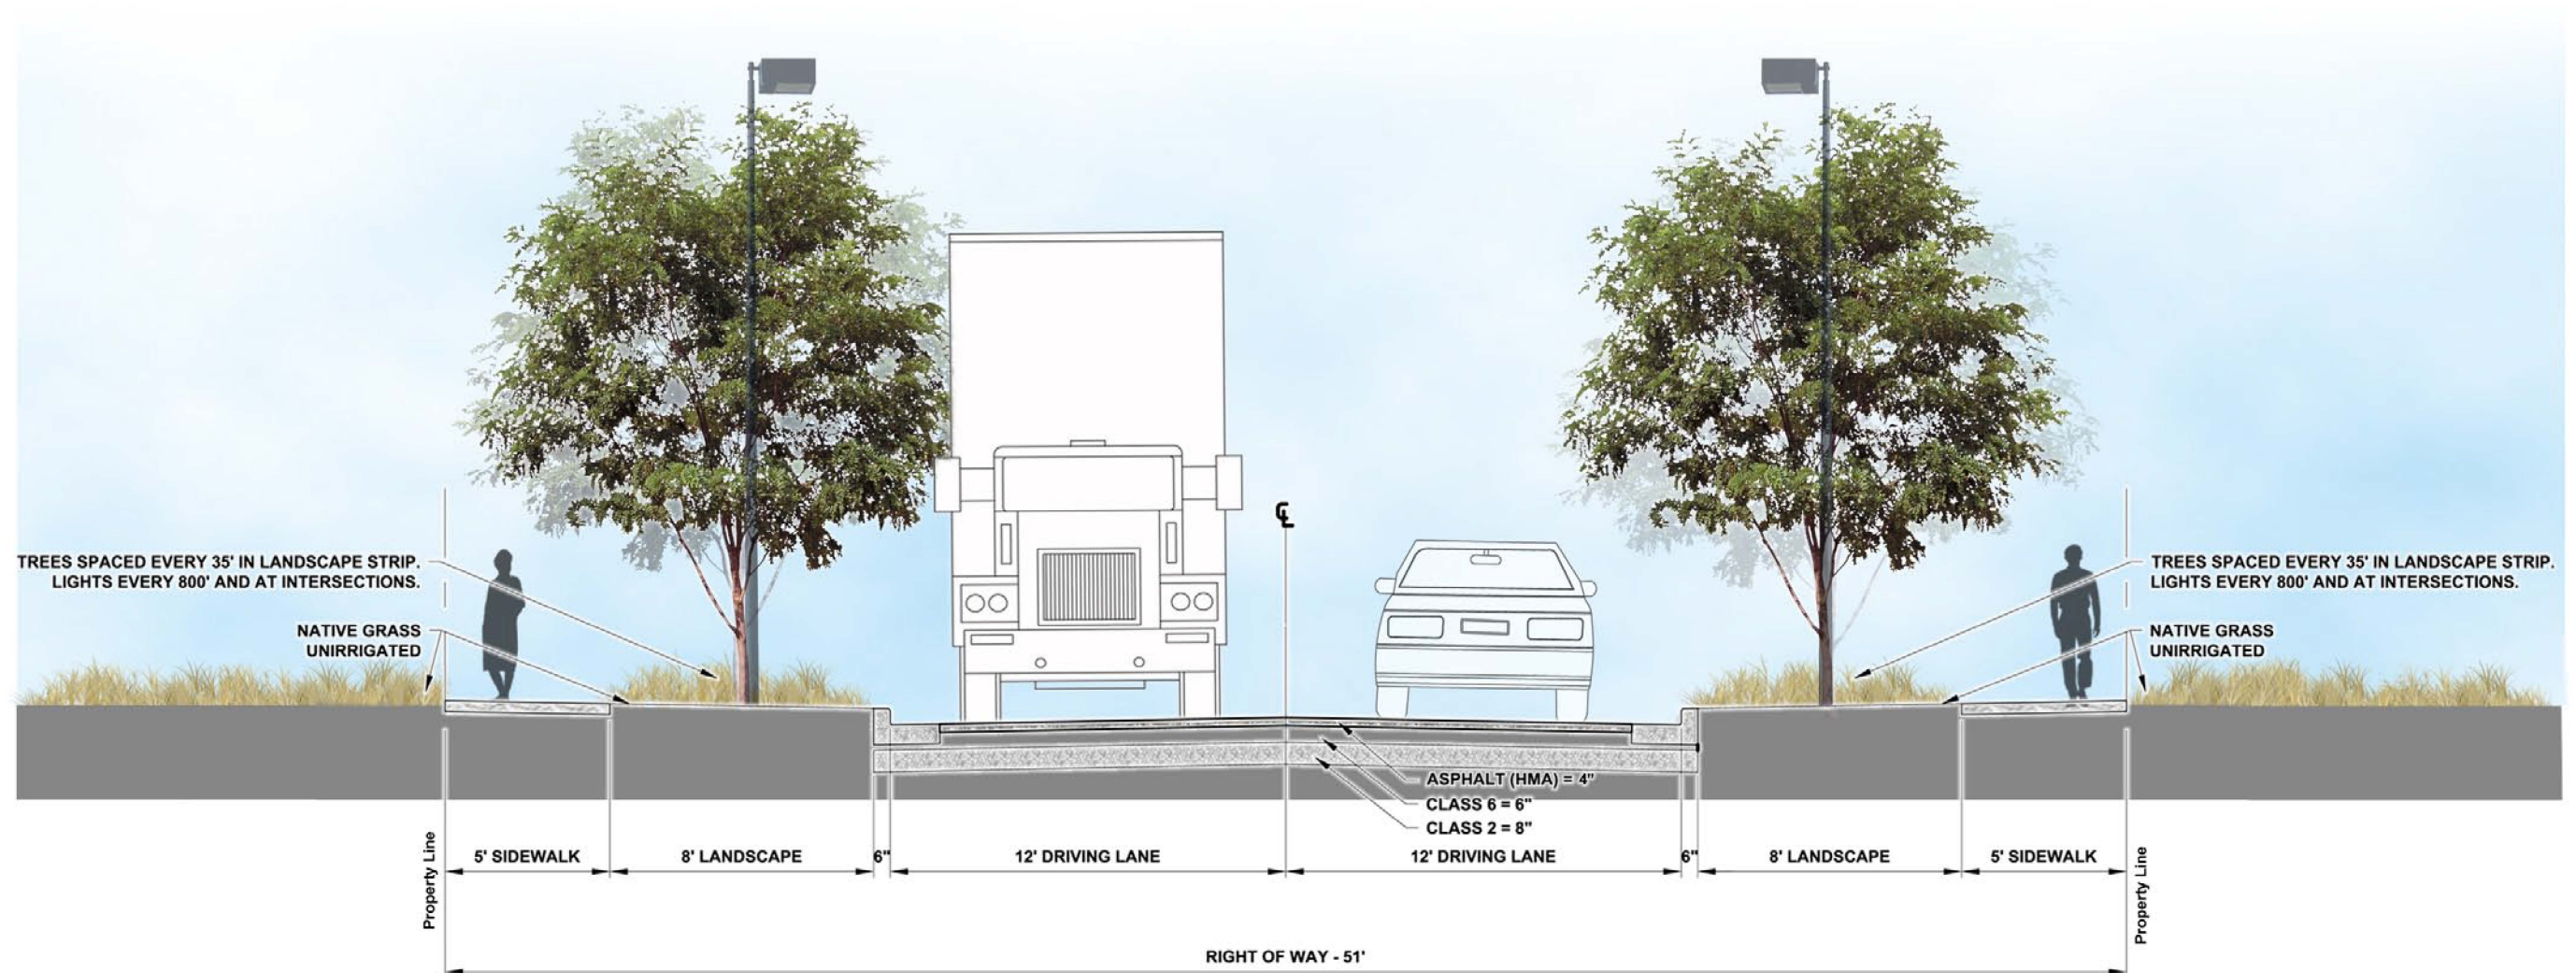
EXHIBIT N - ROADWAY SECTION - SECONDARY ACCESS/EMERGENCY ACCESS
